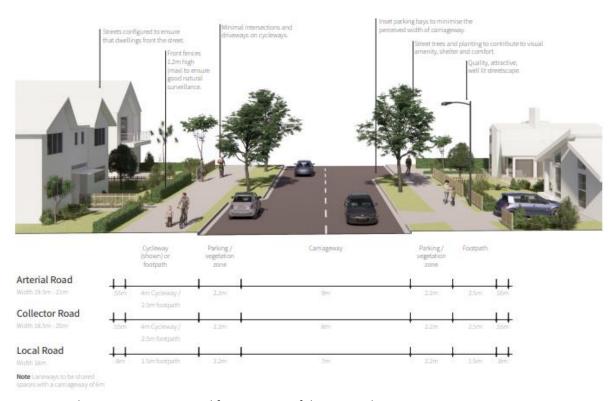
Road cross-sections extracted from page 12 of the masterplan
